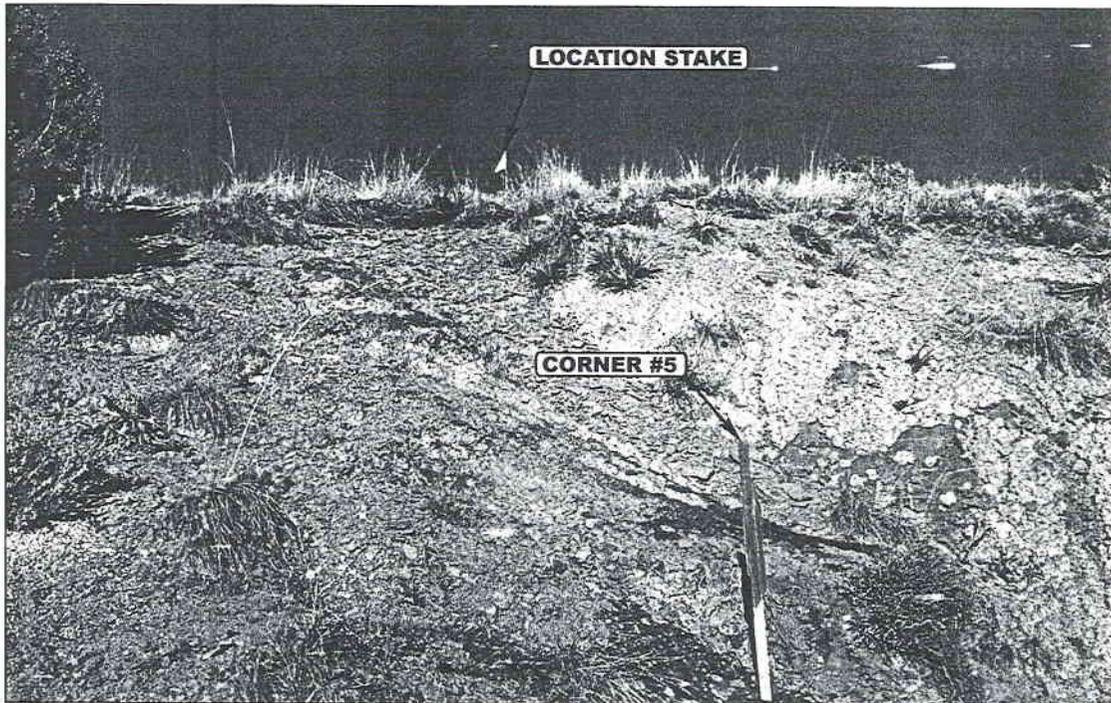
PHOTO: VIEW FROM LOCATION STAKE TO CORNER #5
